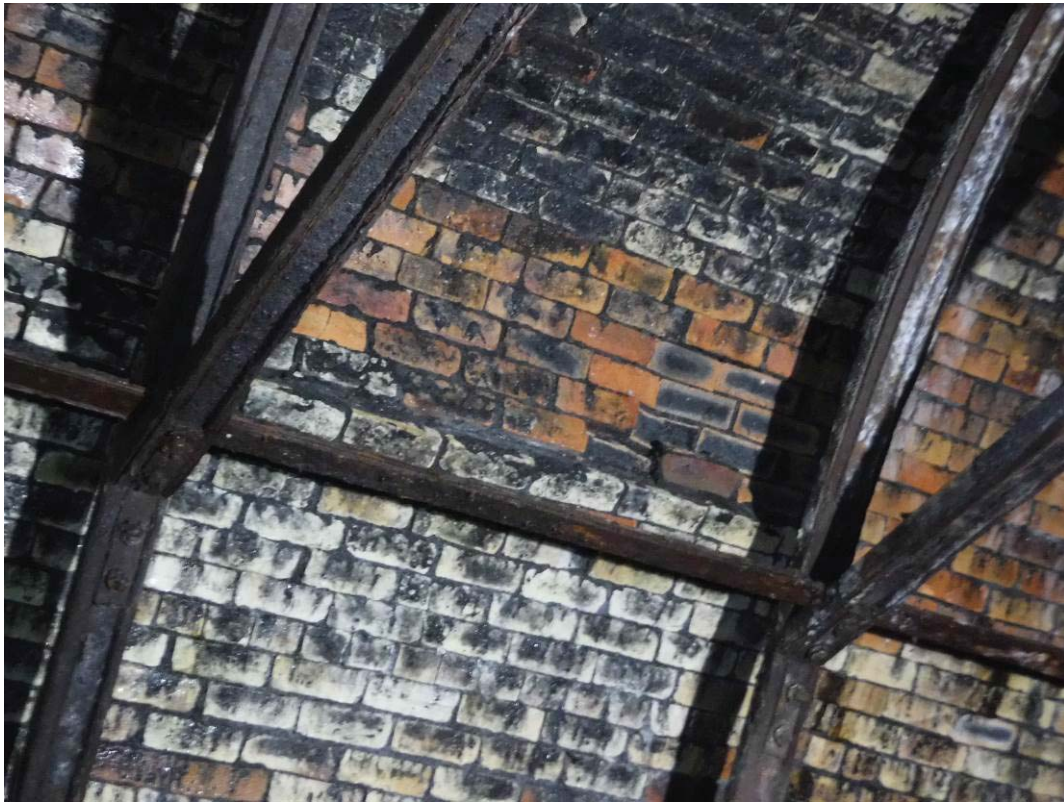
002+06 to 002+30 Haunch Down, Brickwork, haunch failed with missing bricks, hanging bricks, distorted profile, hollow, area 8sq.m.
